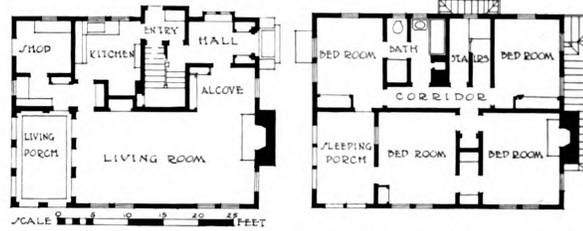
Plan showing convenient arrangement with omission of conventional dining room. Area 945 square feet, including porches
